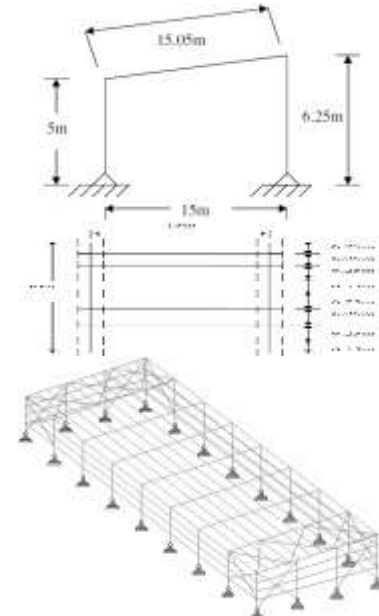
Plan and Elevation and 3D View of low Span PEIB
